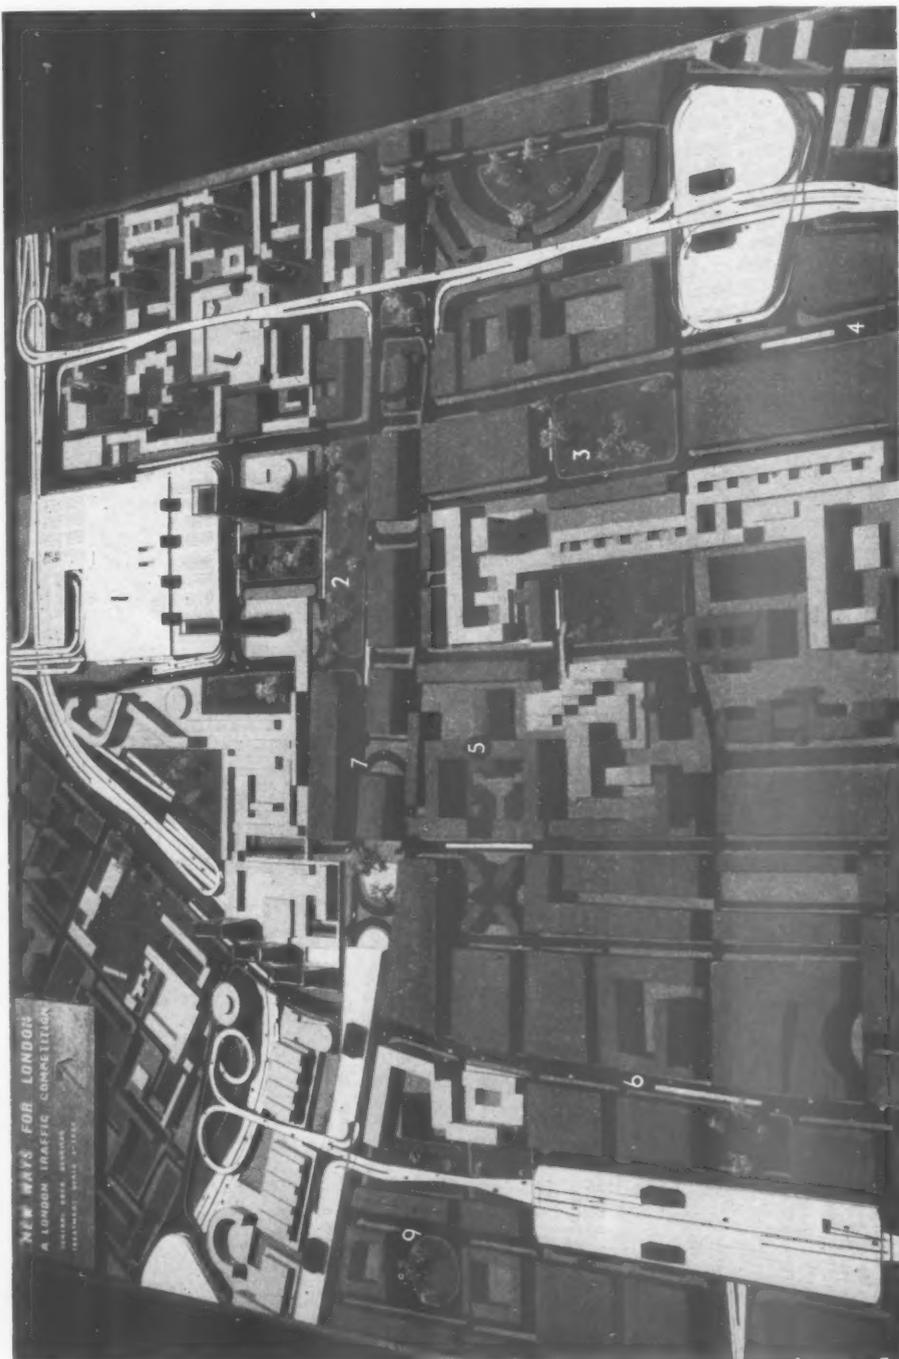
DETAILED SCHEME: The detailed scheme covers an area of Hackney north of Victoria Park. Pedestrian traffic is not referred to, and it is intended that pedestrians should cross the sunken roads by bridges. But only one bridge is in fact provided in this area,
